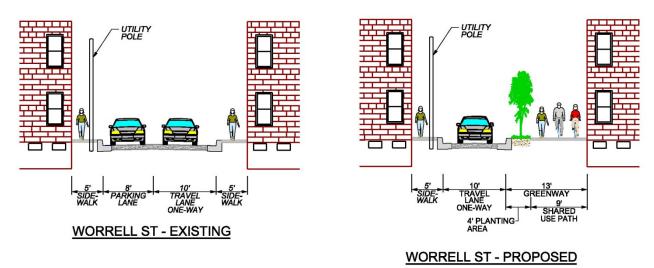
Worrell Street Cross Section, looking south toward Frankford Avenue
